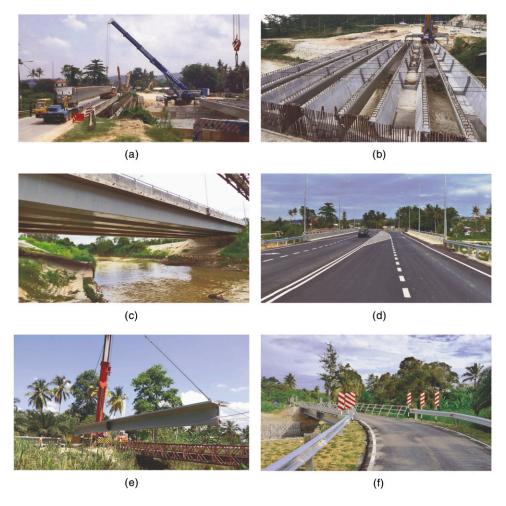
Examples of UHPC segmental bridge construction (images by Yen Lei Voo): (a–d) 51.6-m-span Rantau-Siliau bridge, U-shaped UHPC girder with composite conventional strength concrete deck; (e and f) 30-m-span Ulu Chemor bridge, stitched T-girder construction
